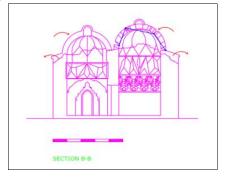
Collapsed Dome and Reconstructed Wall, İsmail Bey Bath, İznik
